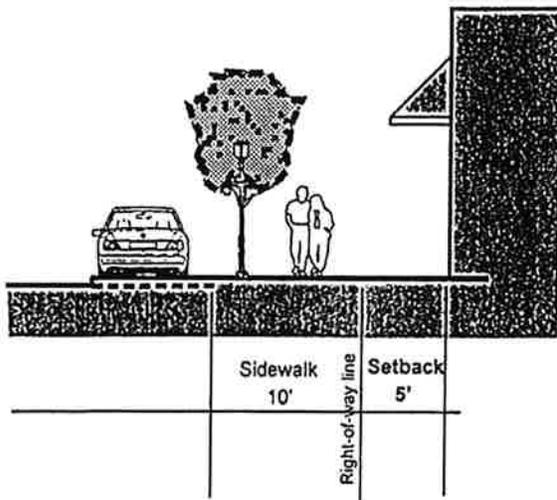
New buildings shall be placed 5-feet from the street right-of-way line to allow for wider sidewalks.
